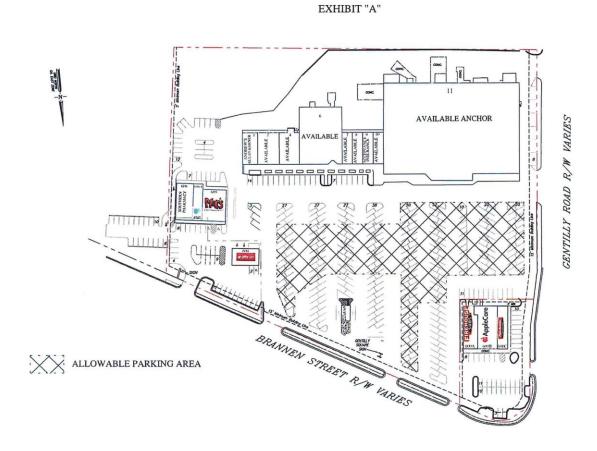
EXHIBIT J: GENTILLY SQUARE ALLOWED PARKING AREA SITE PLAN
